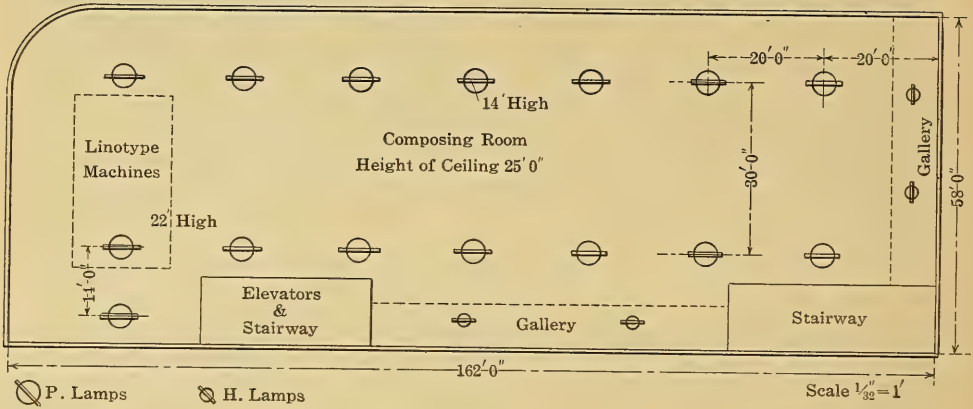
FLOOR PLAN. COMPOSING ROOM.
